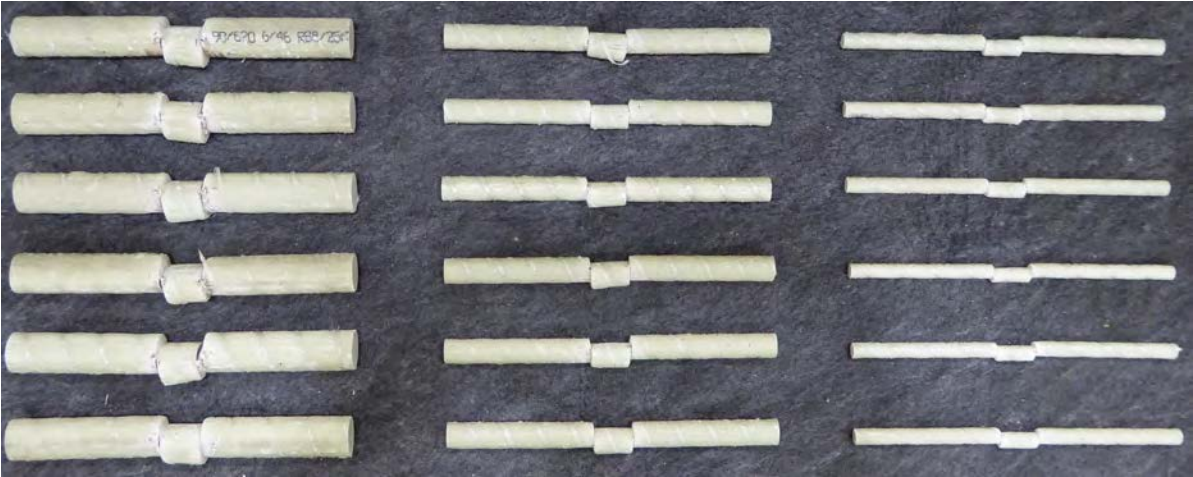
Transverse shear test — failure mode of all tested rebar sizes
